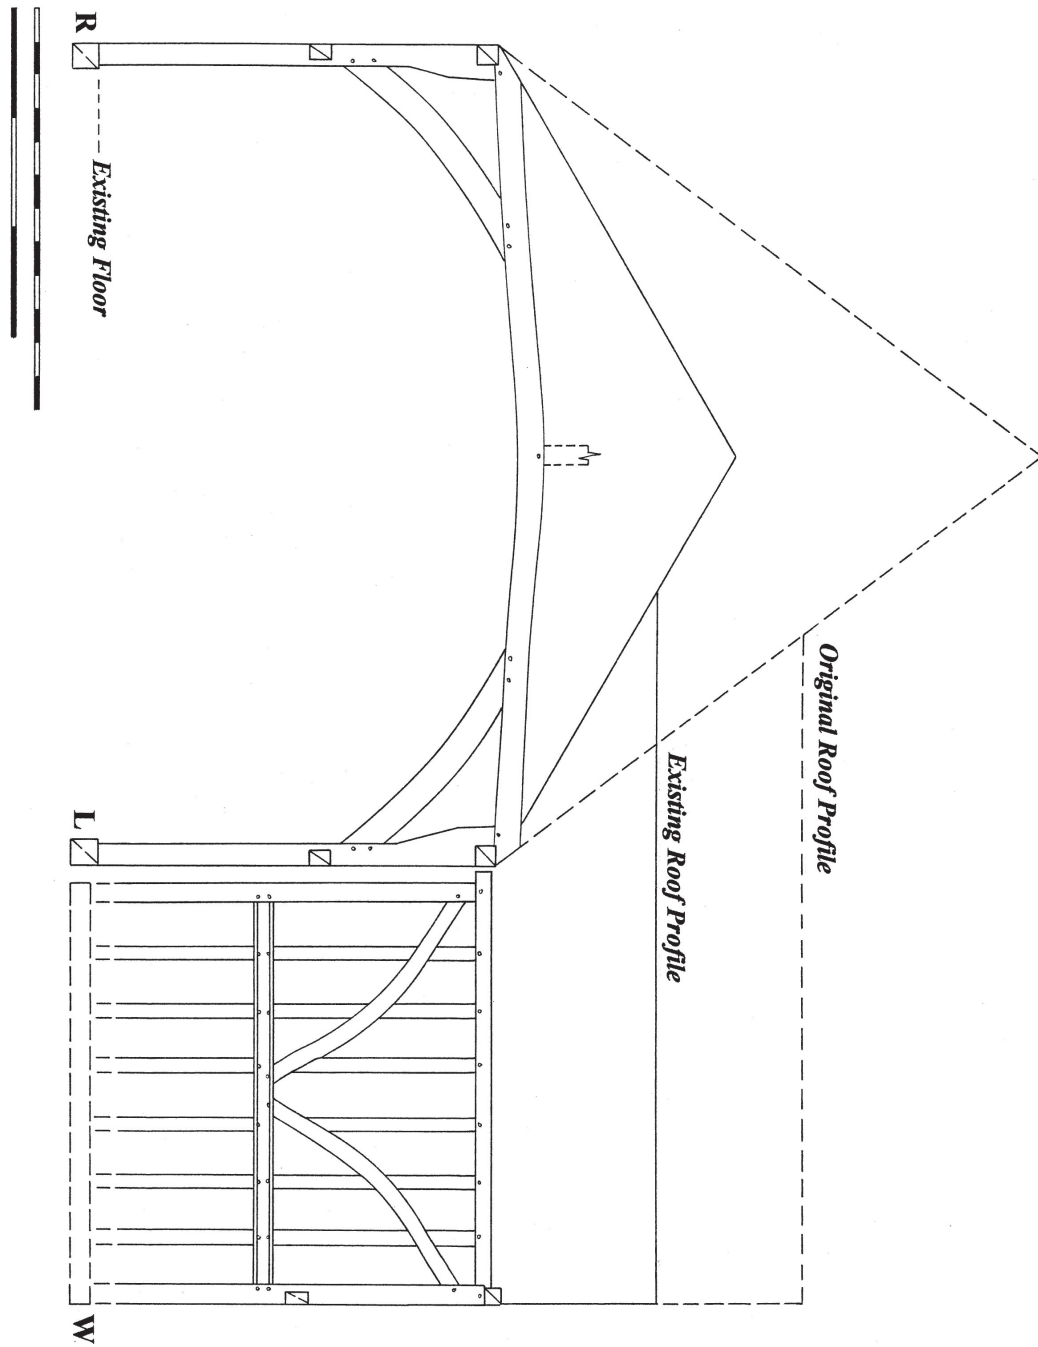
Barn 1: open truss R-L from east with internal elevation M-W of porch.
